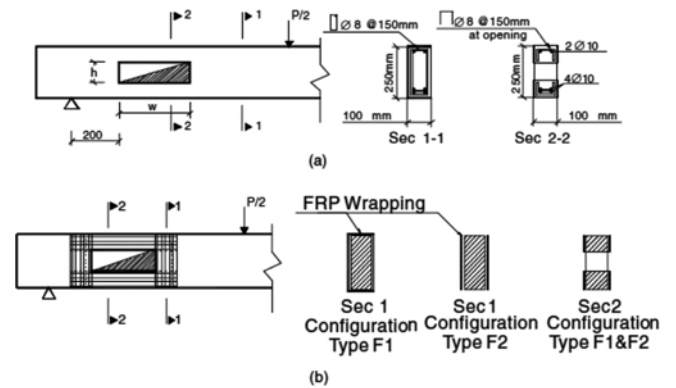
Details of the Tested Beams: (a) Internal Steel Reinforcement, (b) Types of External CFRP Strengthening (Abdalla *et al.*, 2003)
